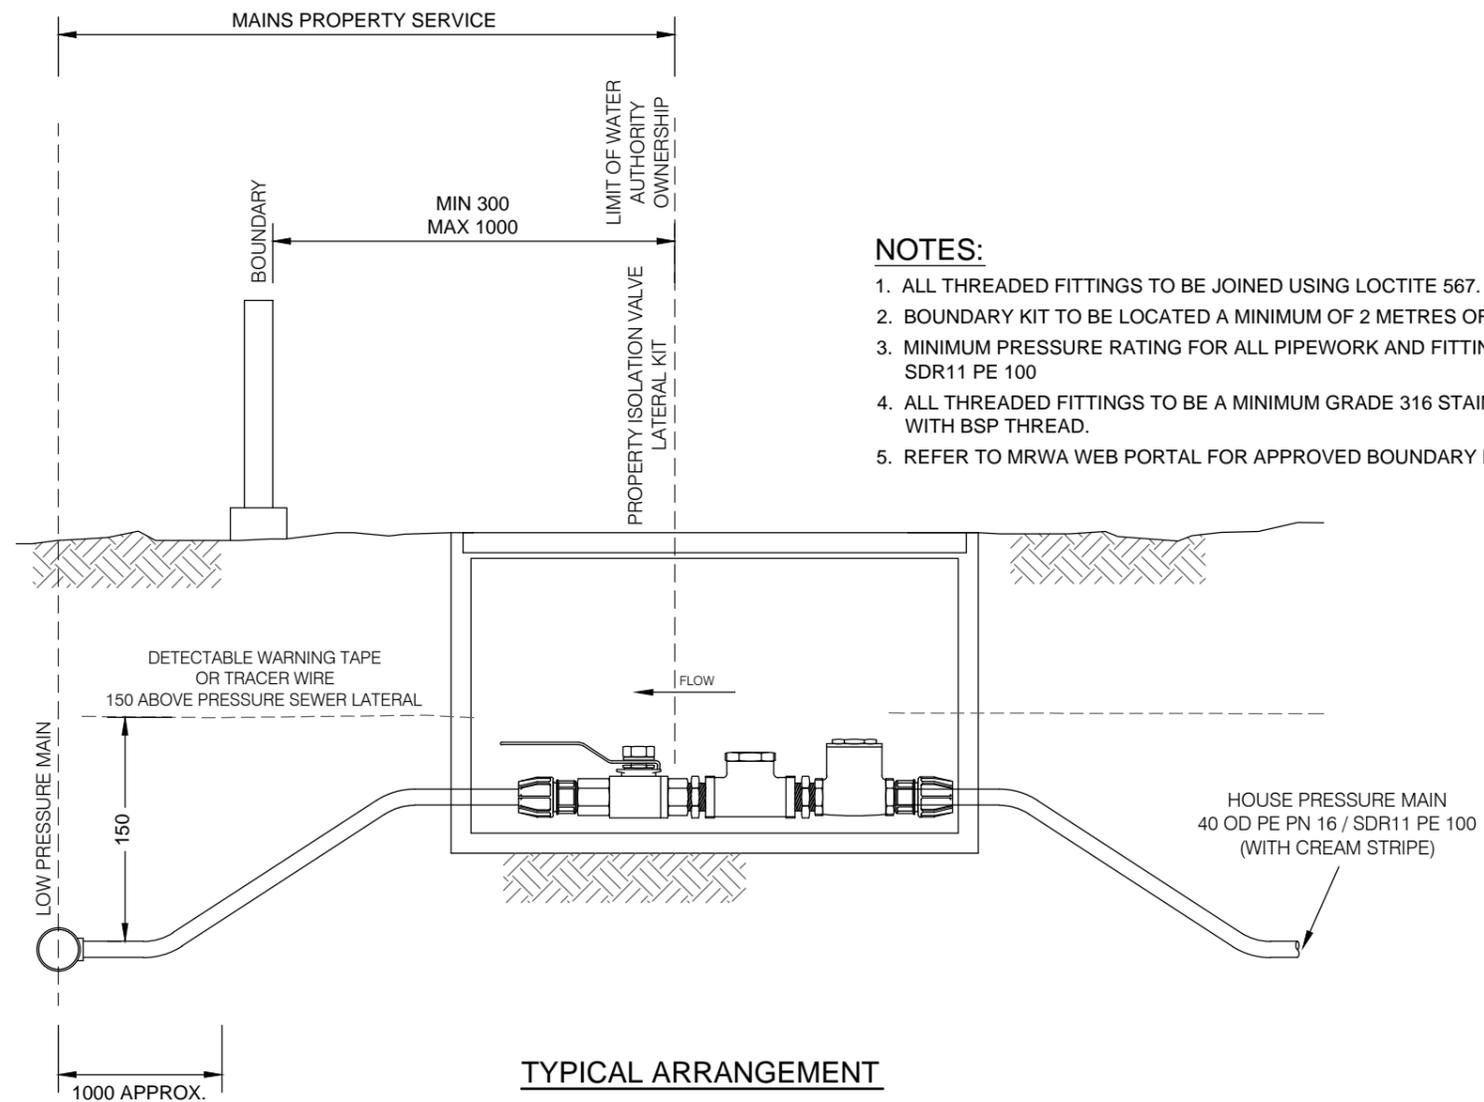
DETAIL - PROPERTY BOUNDARY ASSEMBLY
